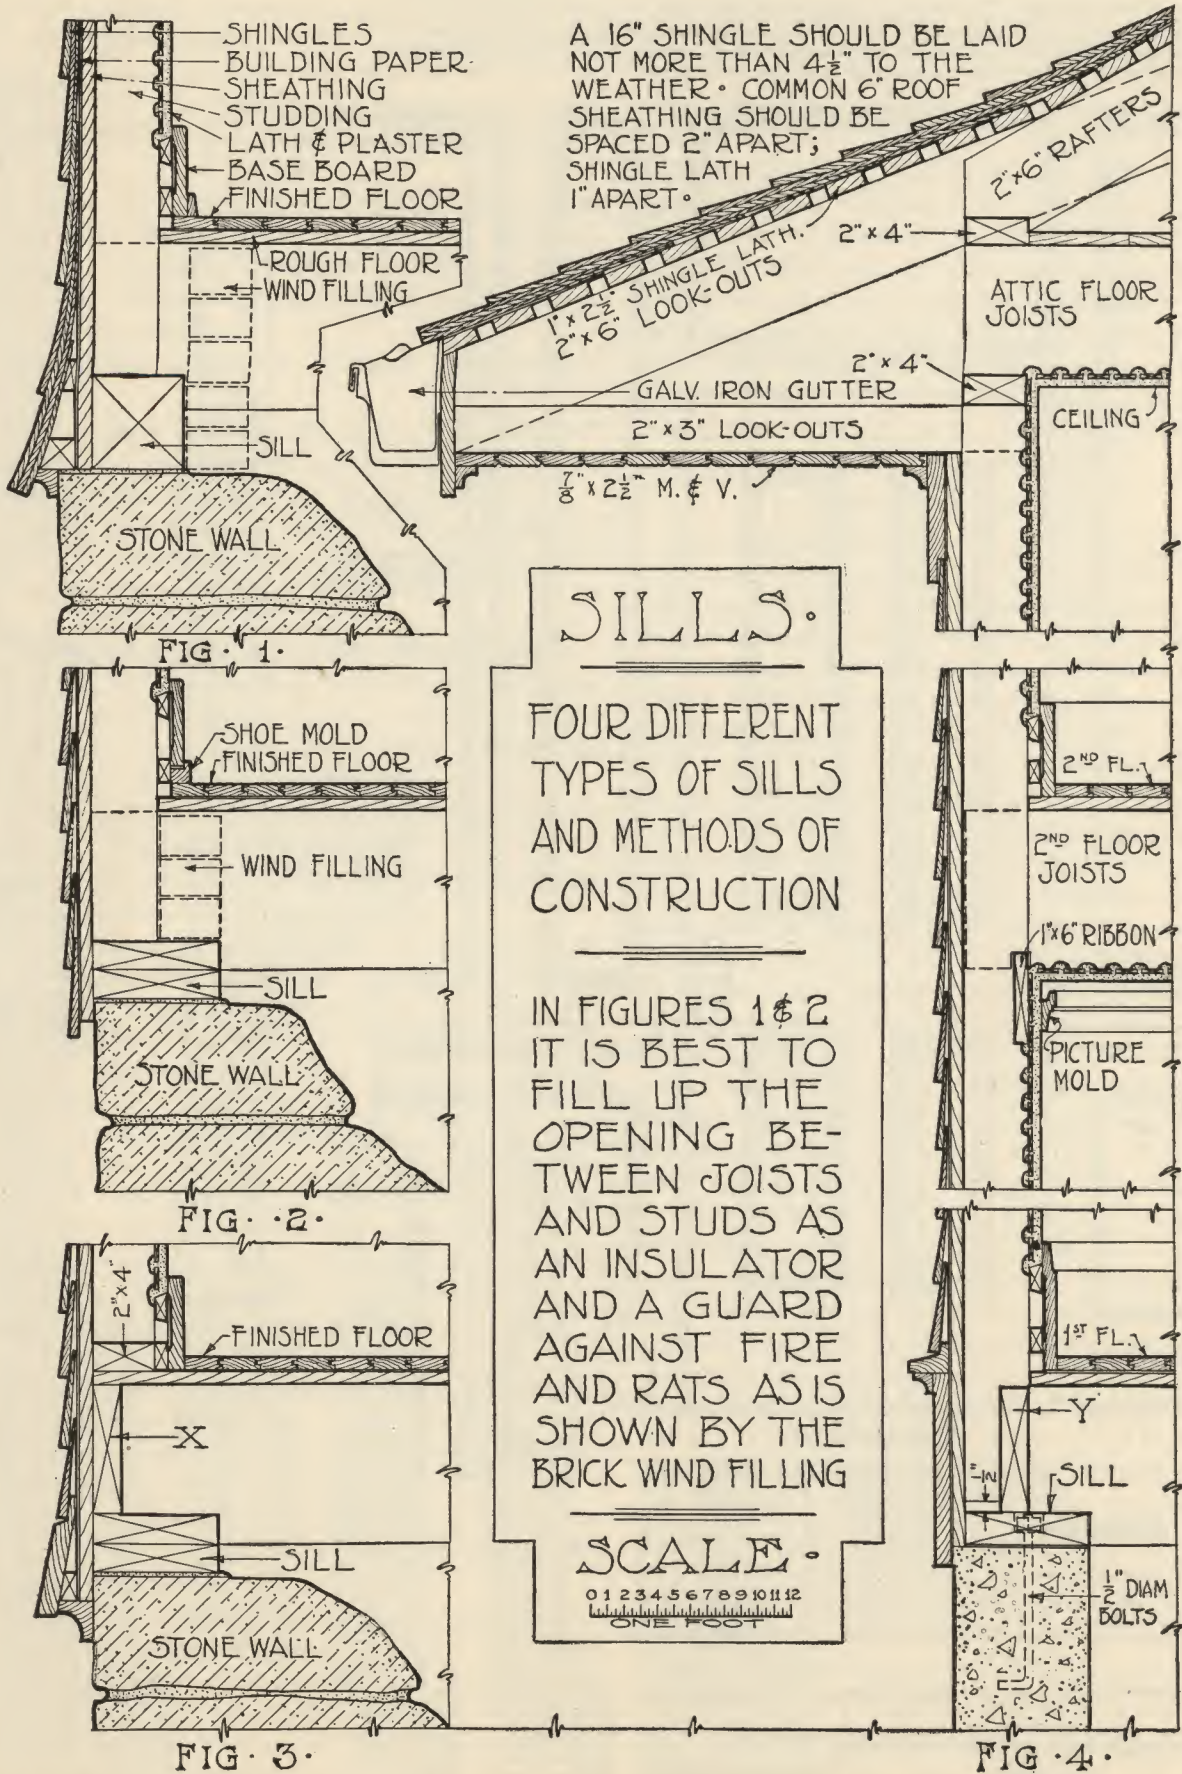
Plate VIII. Scale Details Showing Four Types of Sill Construction.
